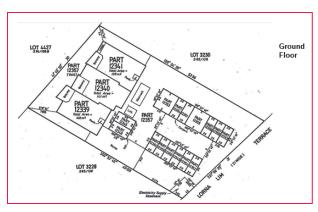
Strata Plan - Ground Floor as per Strata Plan
